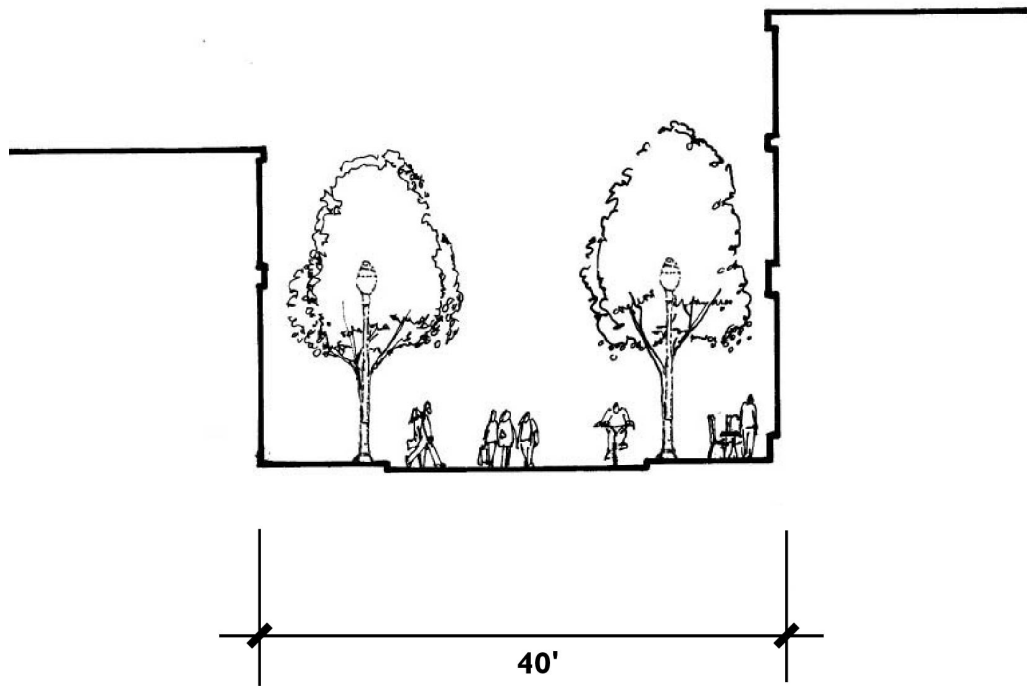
Pedestrian-Oriented Walkways Minimum Section
